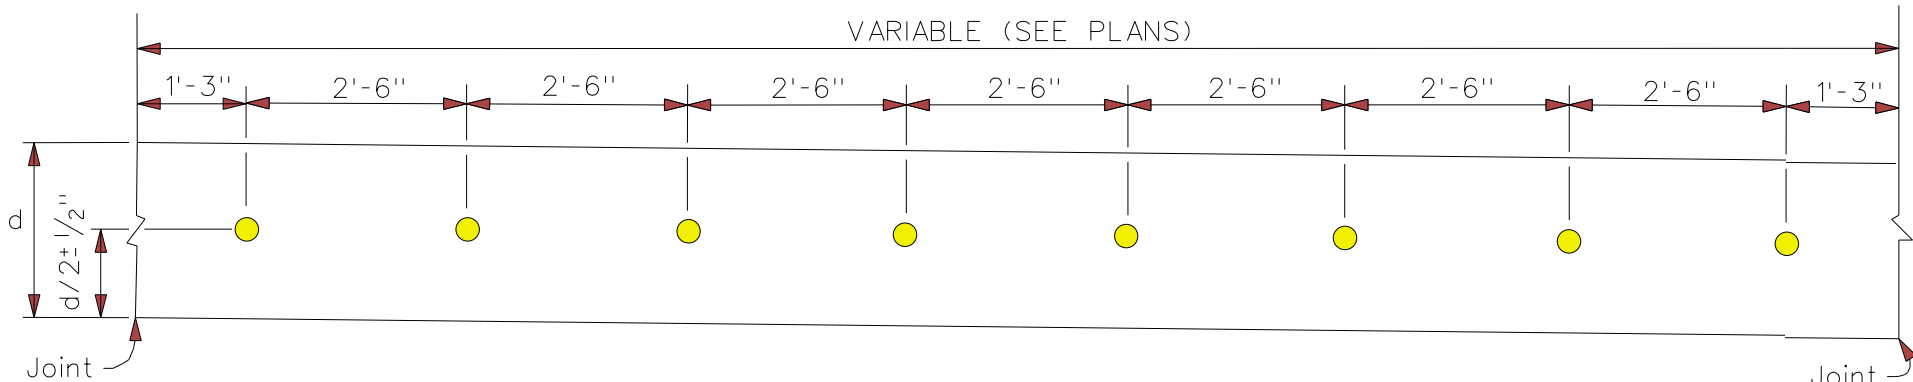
DETAIL OF TRANSVERSE CONSTRUCTION AND CONTRACTION JOINTS & LONGITUDINAL CONSTRUCTION AND CONTRACTION JOINTS
